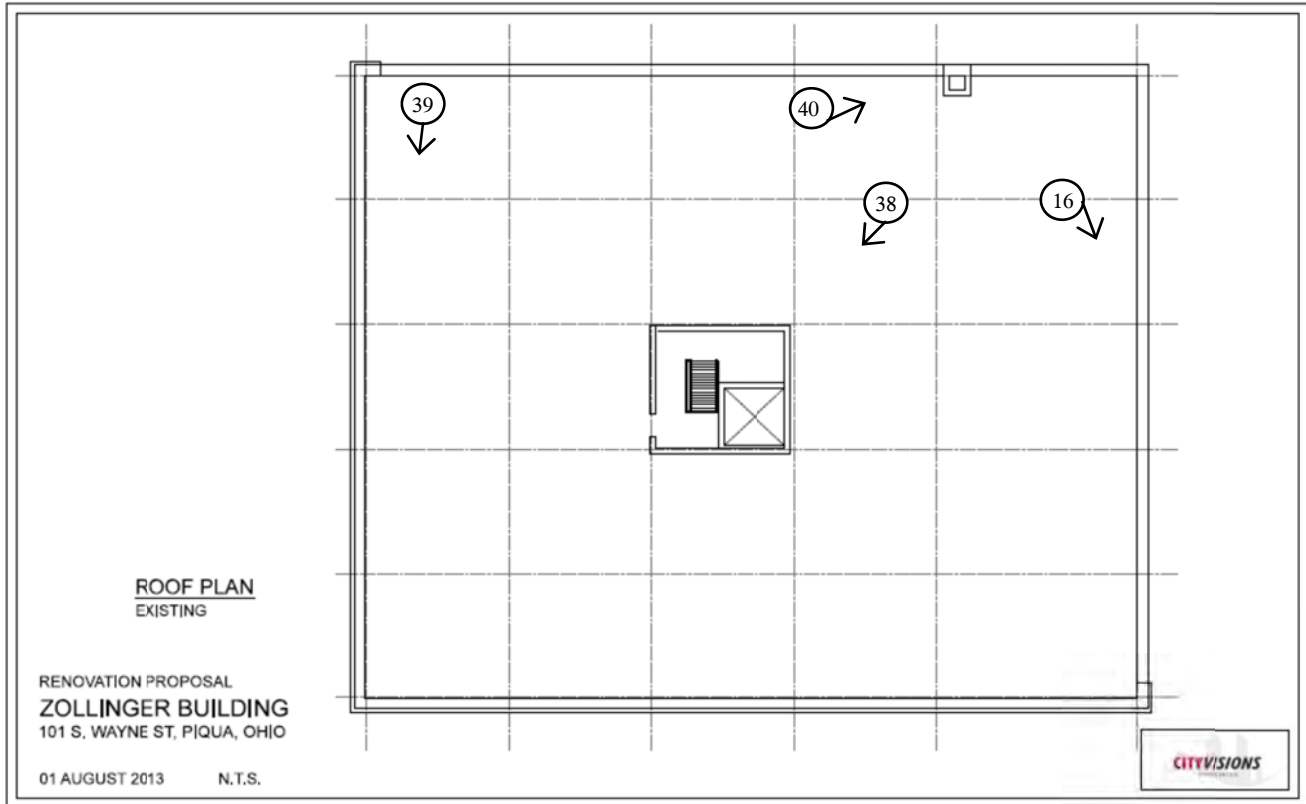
Existing Terrace Floor Plan, Zollinger Building showing location of photographs 16 and 38-40 (City Visions, Inc.)
